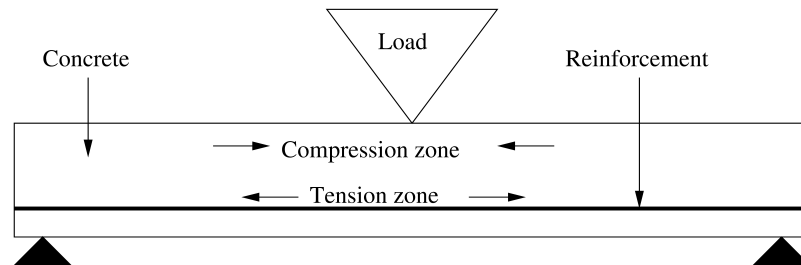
Reinforced concrete with compressive and tensile forces.
